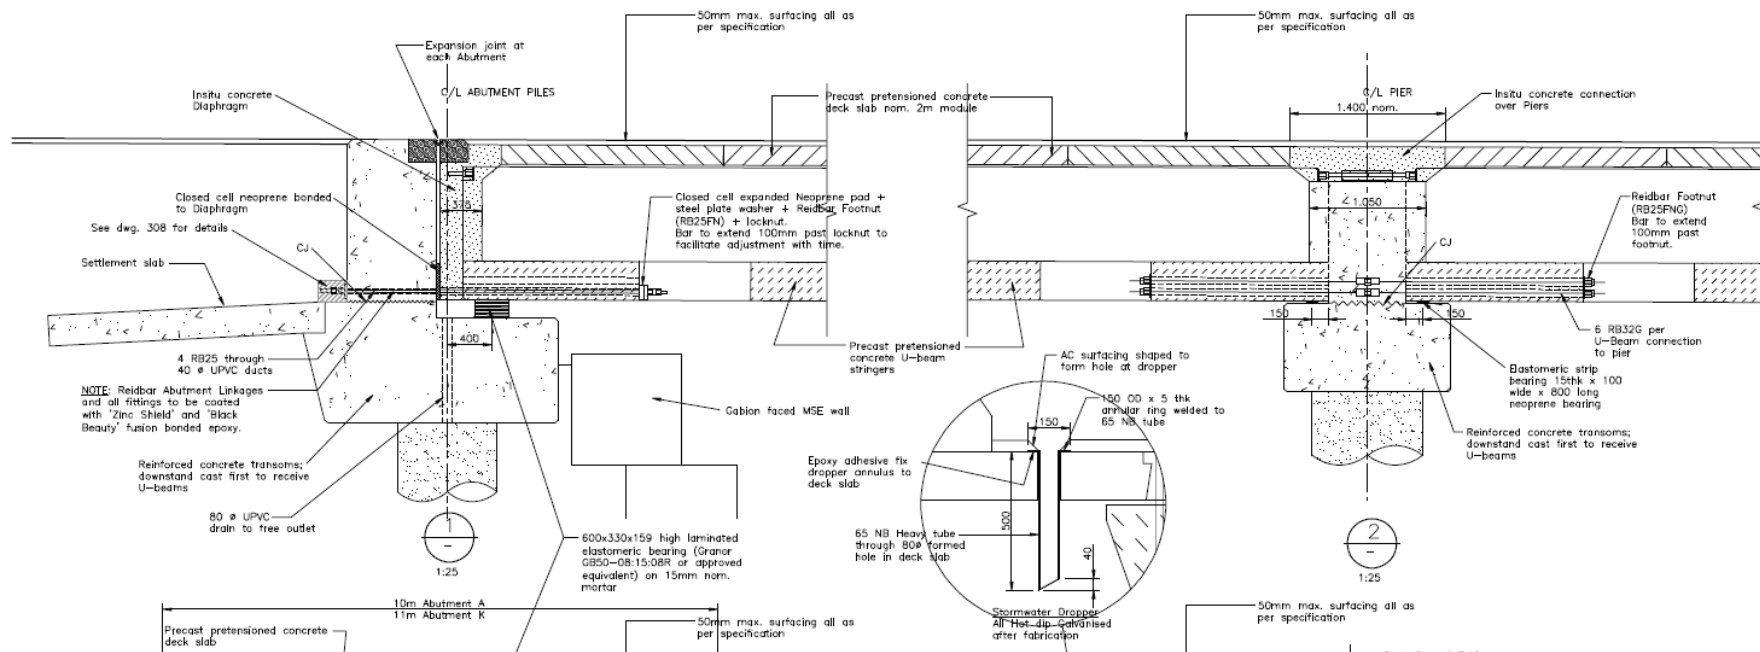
Abutment-beam and beam-beam/pier connections.
